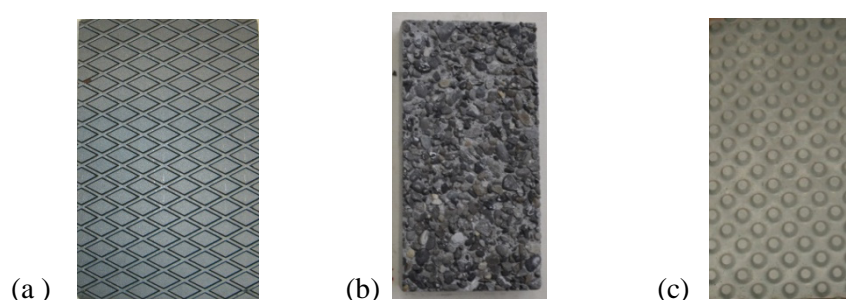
Surfaces of plates for the direct shear block specimens a) embossed steel, b) roughened concrete, c) UHPFRC with conical studs
